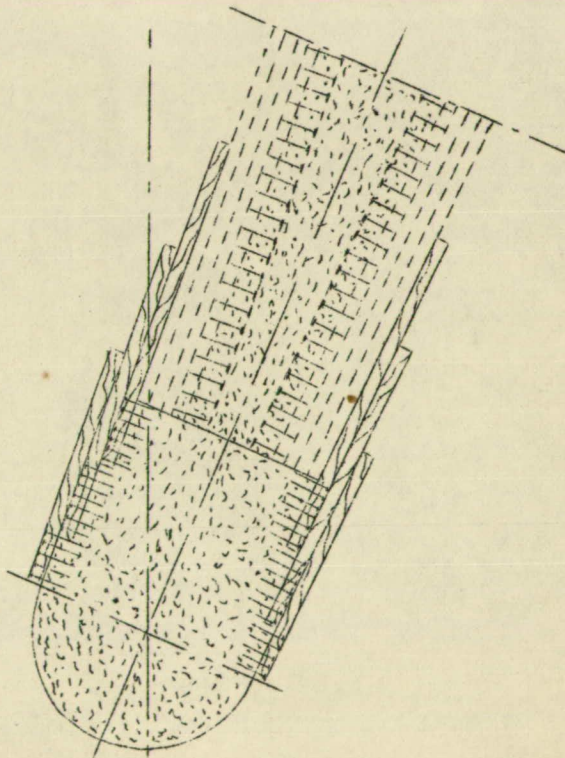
Assembly of lower concrete girder with wooden framework of the centering.
